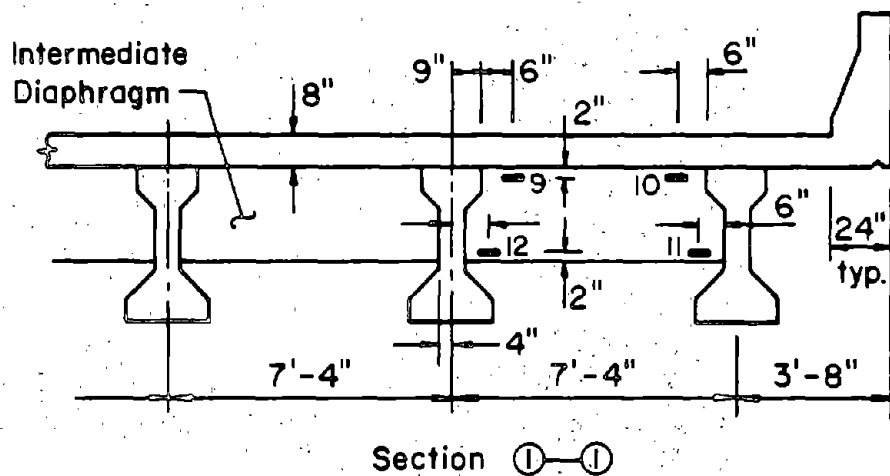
Partial plan and cross section of superstructure showing locations of transducers and strain gauges.
